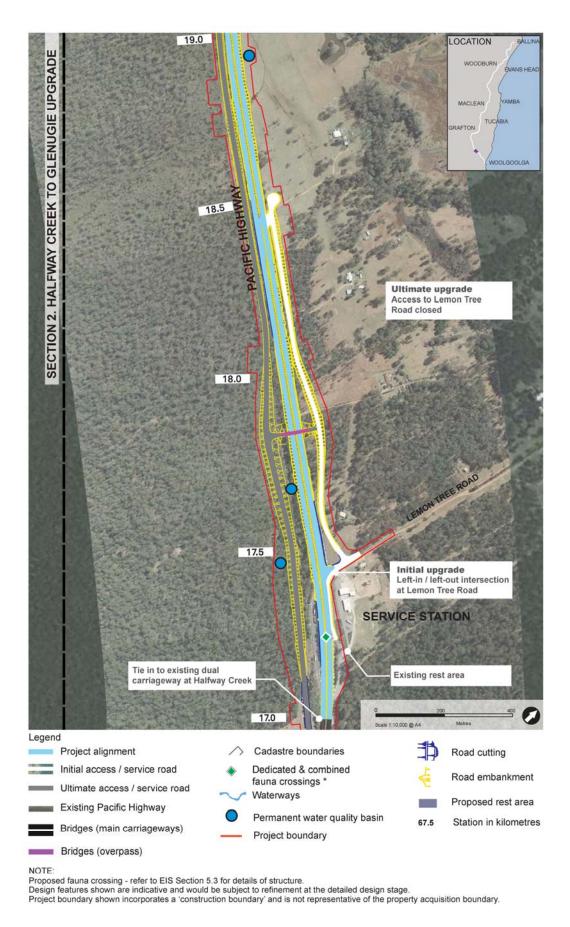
The project - Section 2 (Station 17.0 to 19.0)
